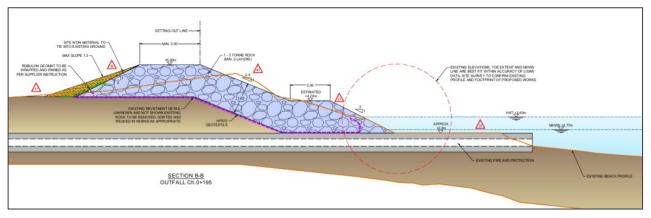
Site 2/3b – Section through Great Pool outfall
